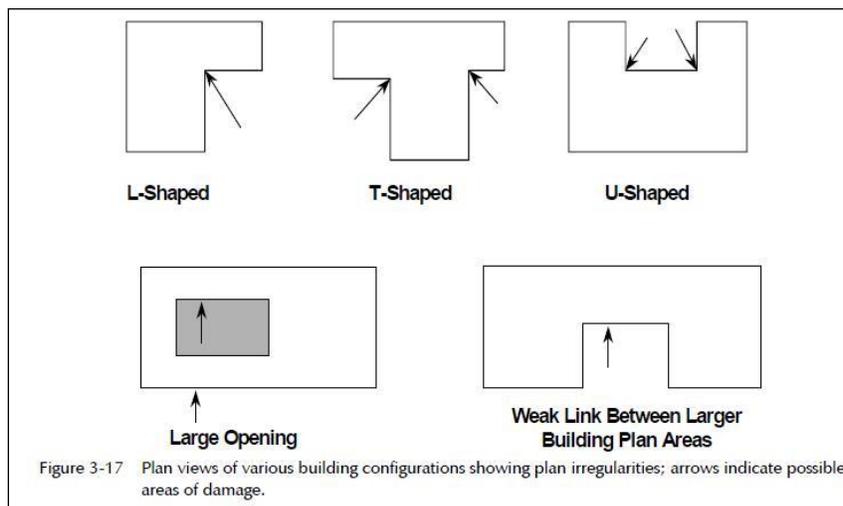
Plan views of various building configurations showing plan irregularities; arrows indicate possible areas of damage.
